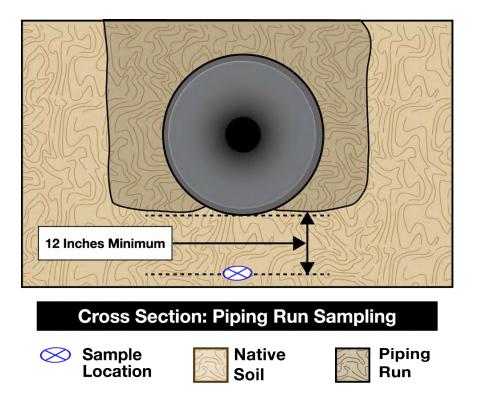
Cross sectional view of sampling locations for a piping trench, with a single pipe.
